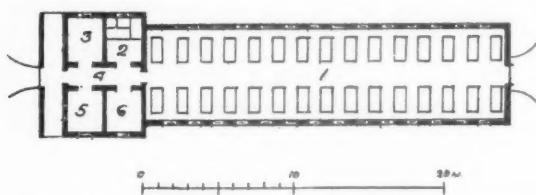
GROUND FLOOR PLAN OF PAVILION, THE MOABIT HOSPITAL, BERLIN.
